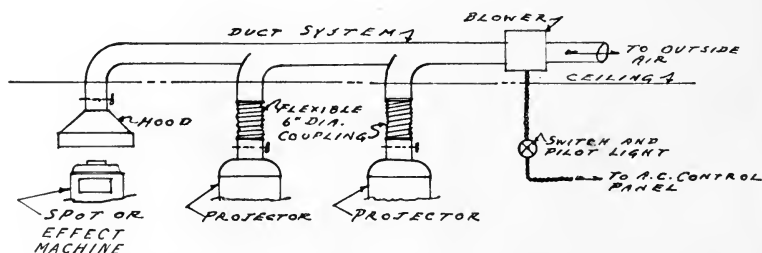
Equipment ventilation system: blower capacity 400 cu.-ft. per min.; minimum air movement through lamp houses with blower idle, 15 cu.-ft. per min.
